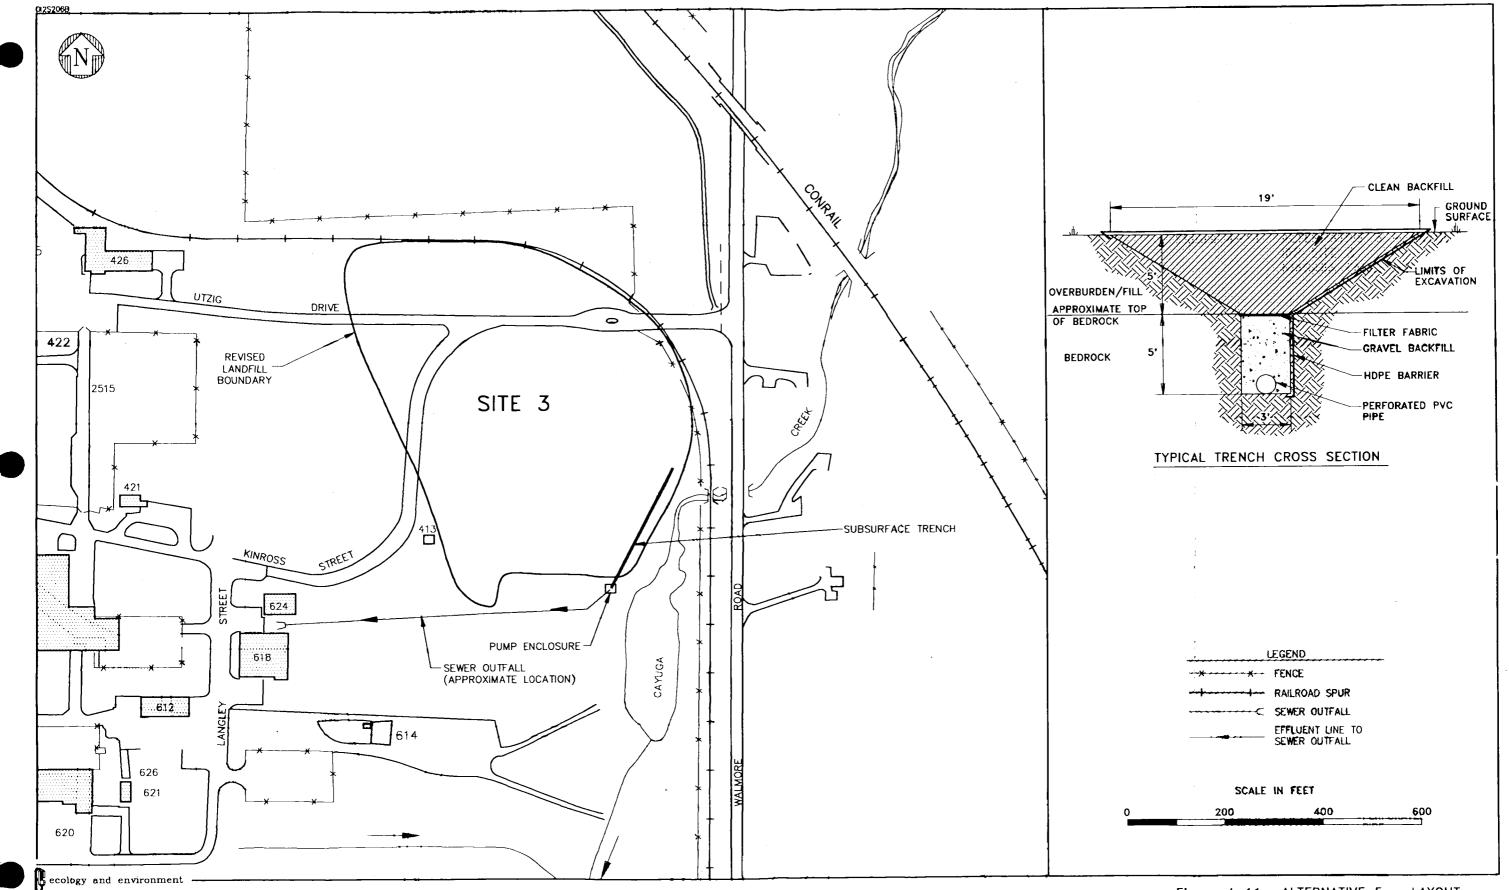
ALTERNATIVE 5 - LAYOUT IRP SITE 3
